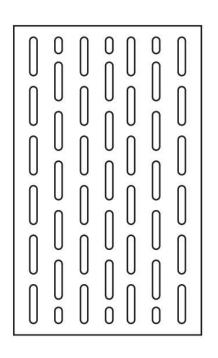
Lightweight concrete masonry units — Geometry 1,7/x
